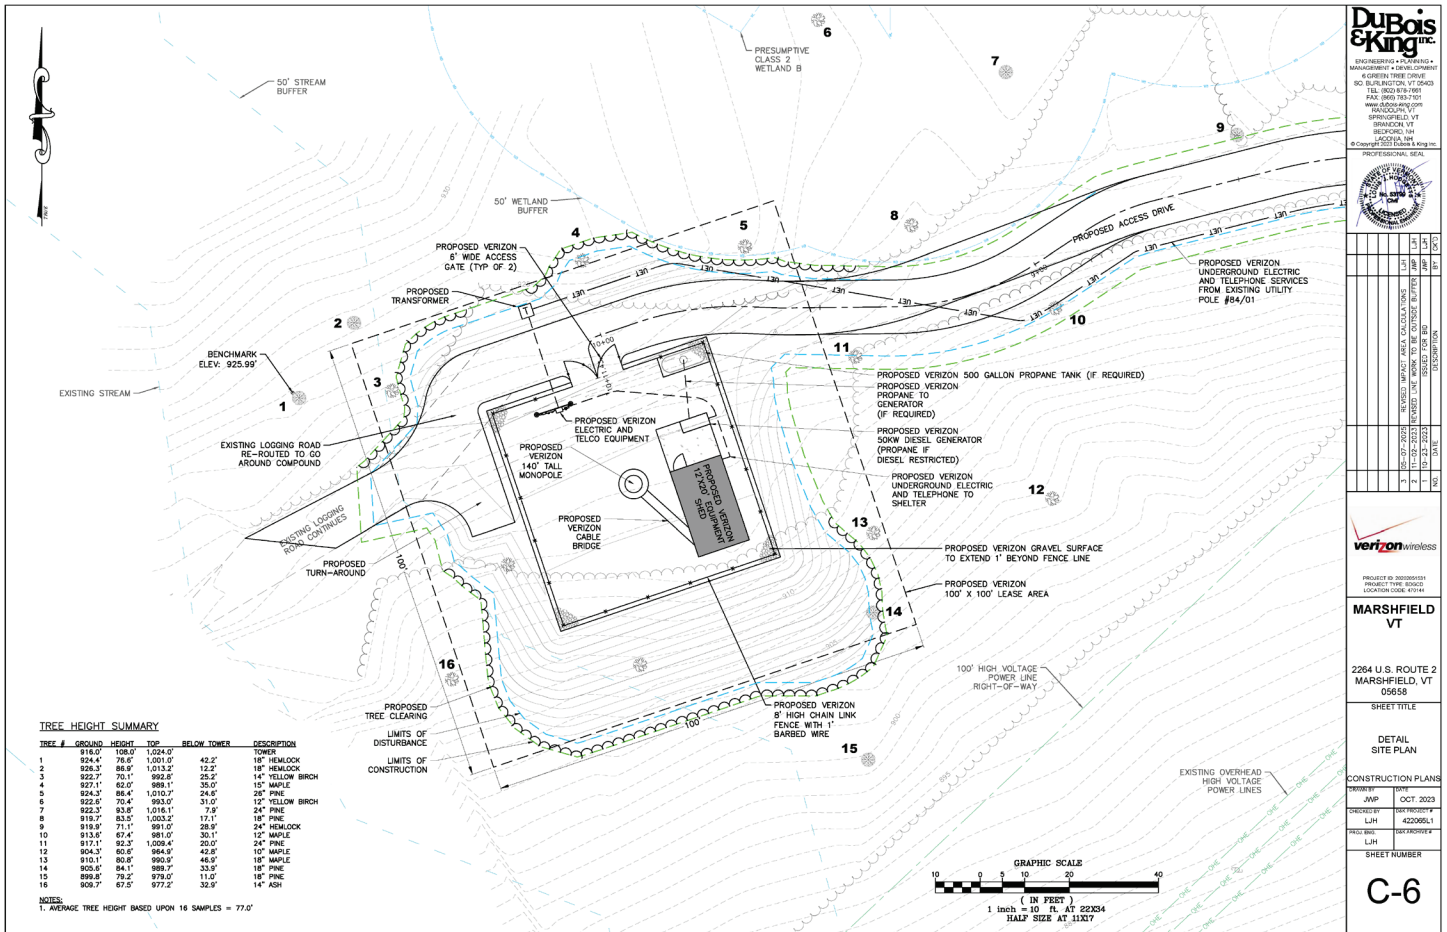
Overall site plan as provided by the Petitioners (Exhibit LH-1 Permit Plans – Sheet C-6)
